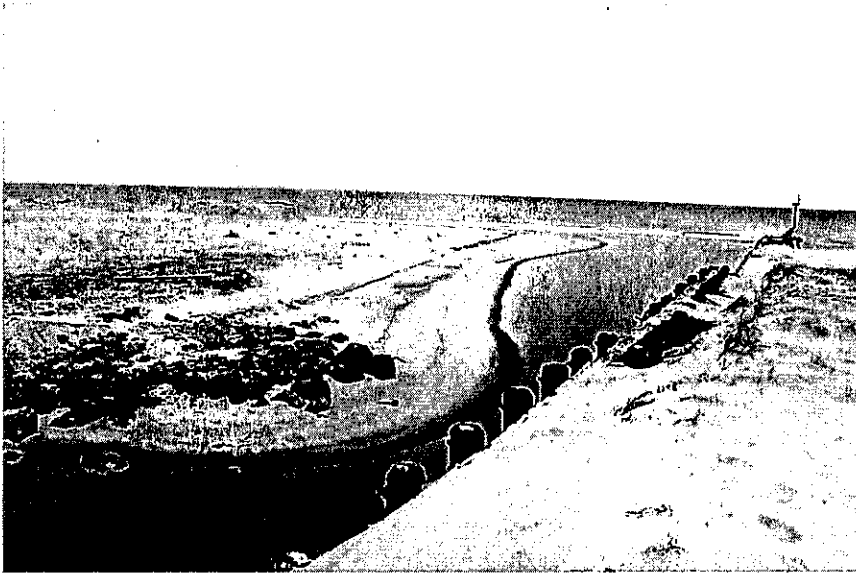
BEFORE - Wreck Pond Inlet facing East showing original outfall pipe
